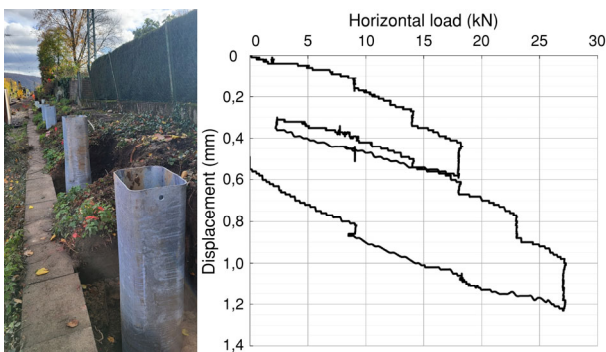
Ground screw foundations for noise barriers and result of horizontal pile load test.
